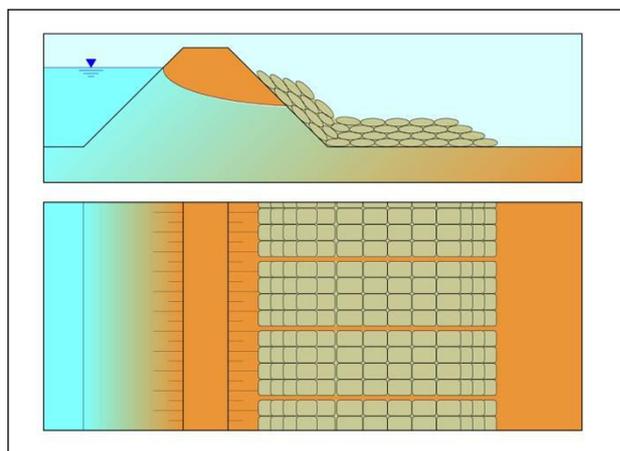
Supporting the landside dike slope with sandbag batches regularly intermitted by drainage gaps
